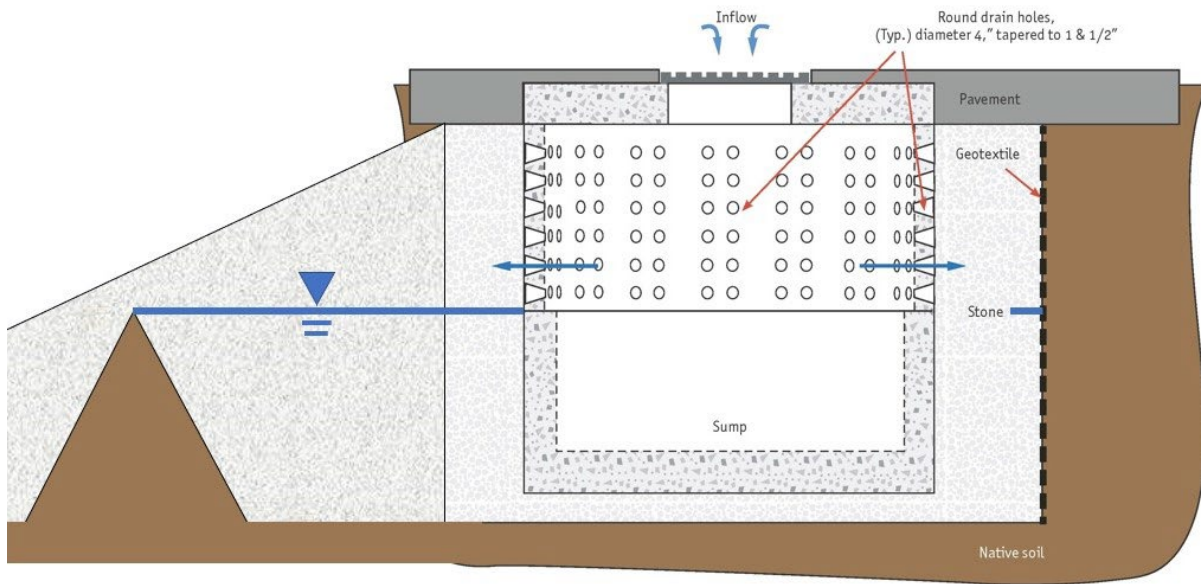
Typical SCM cross-section (not to scale). Source: New England Stormwater Retrofit Manual (VHB, UNHSC 2022)
